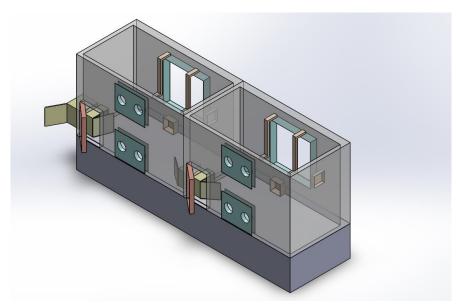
As-built design of the middle and corner hot cells with raised floor.
